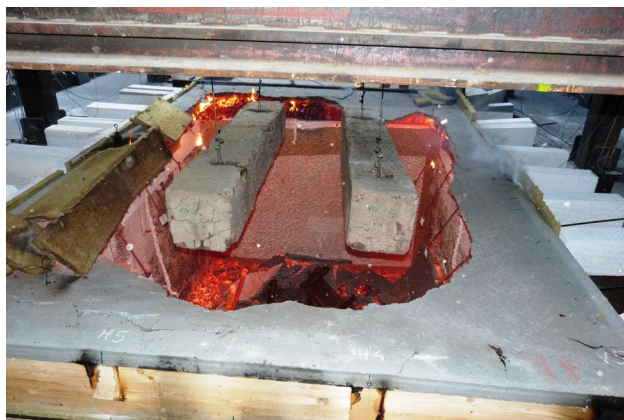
Collapse of composite floor slab ELE-1-120/160 (Caldova et al. 2014a)
